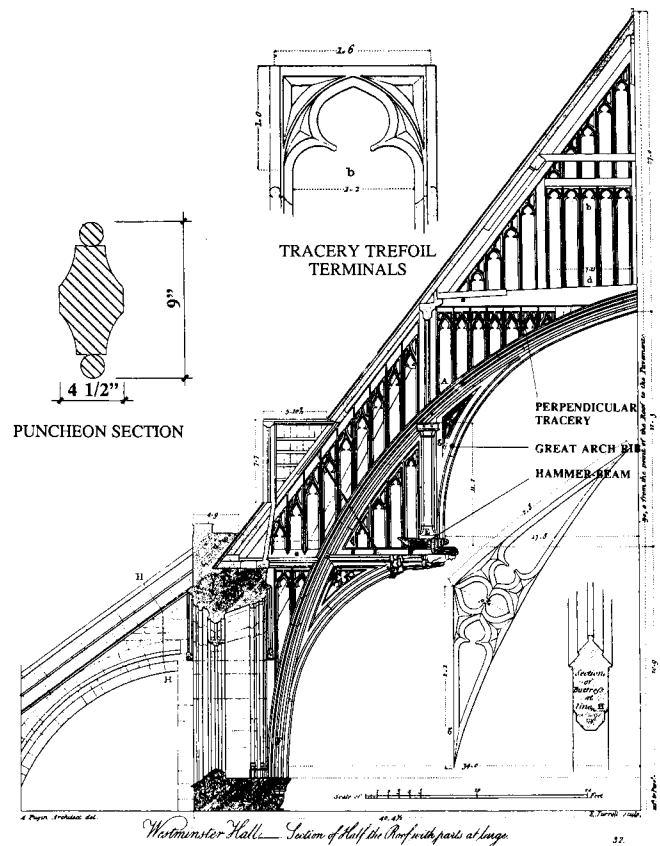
A. C. Pugin, truss and tracery details, Westminster Hall roof, from *Specimens of Gothic Architecture* (1895); section of tracery puncheon added by authors.
